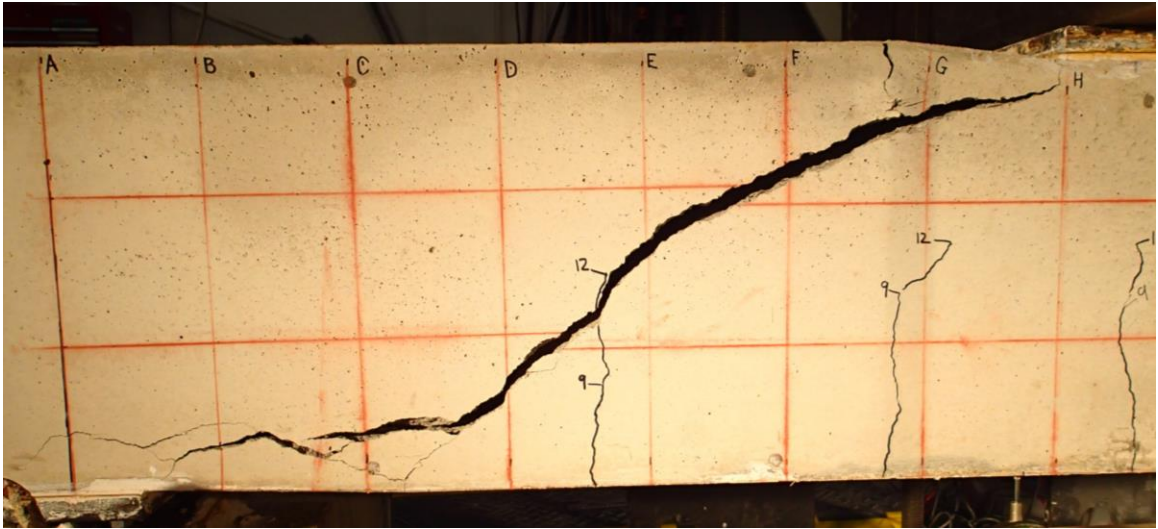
Specimen H-1: North Side Failure Inclined Crack
